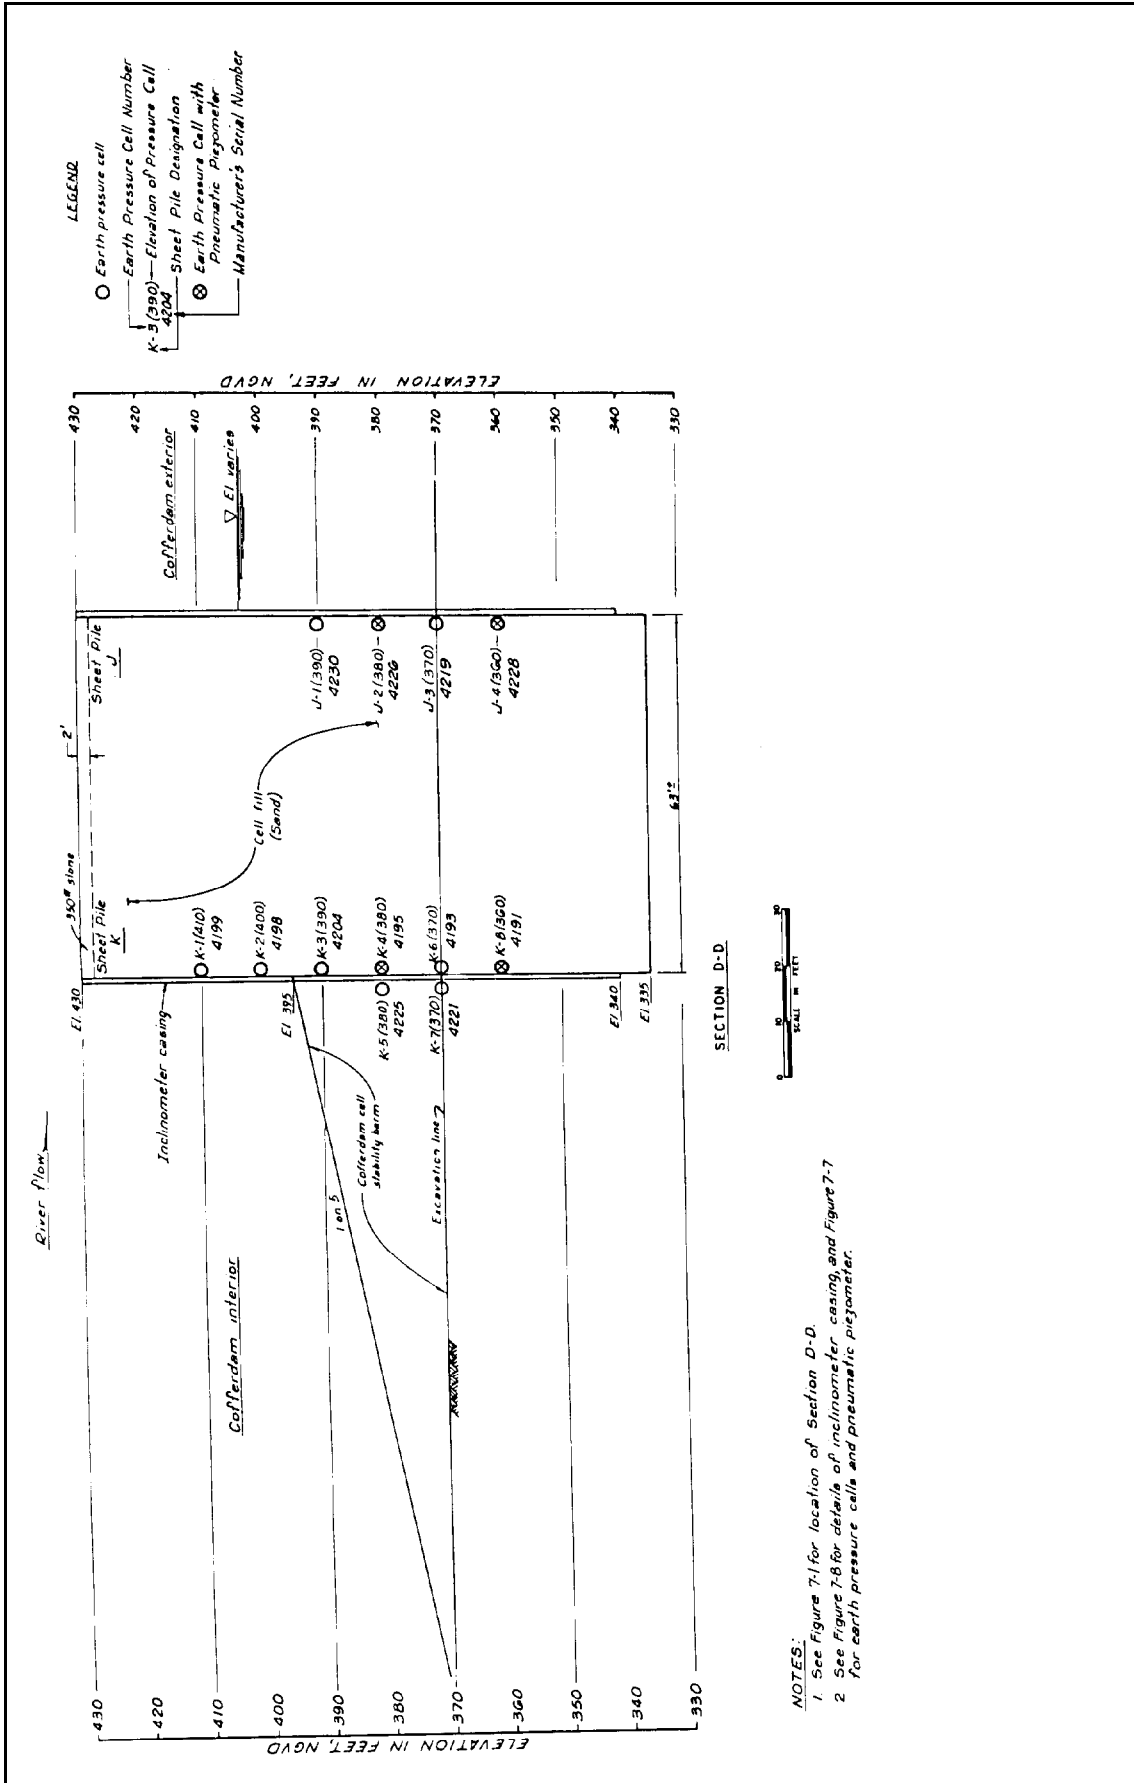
Location of earth pressure cells and inclinometers, section D-D
